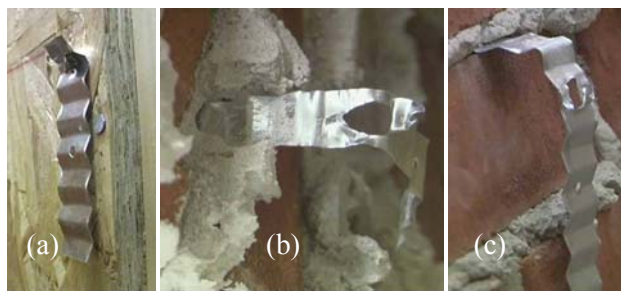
Common tie failure modes noted after collapse of the veneer.
